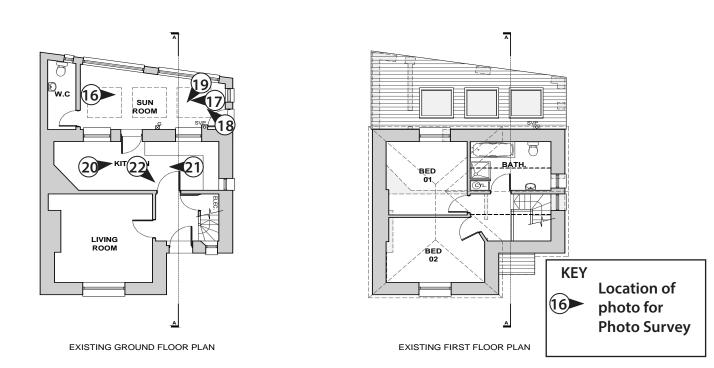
Reproduction of Matthew Jones Architects Drawing No. AL-3141-09/21-PL01B & Exterior Photo Location Plan.
